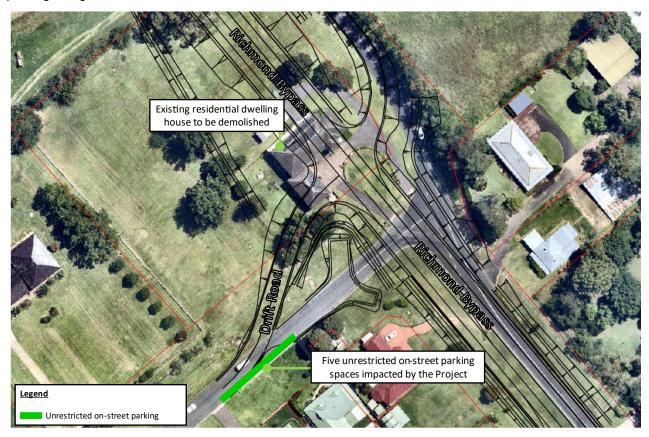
Unrestricted on-street parking spaces along Drift Road impacted by the proposal
